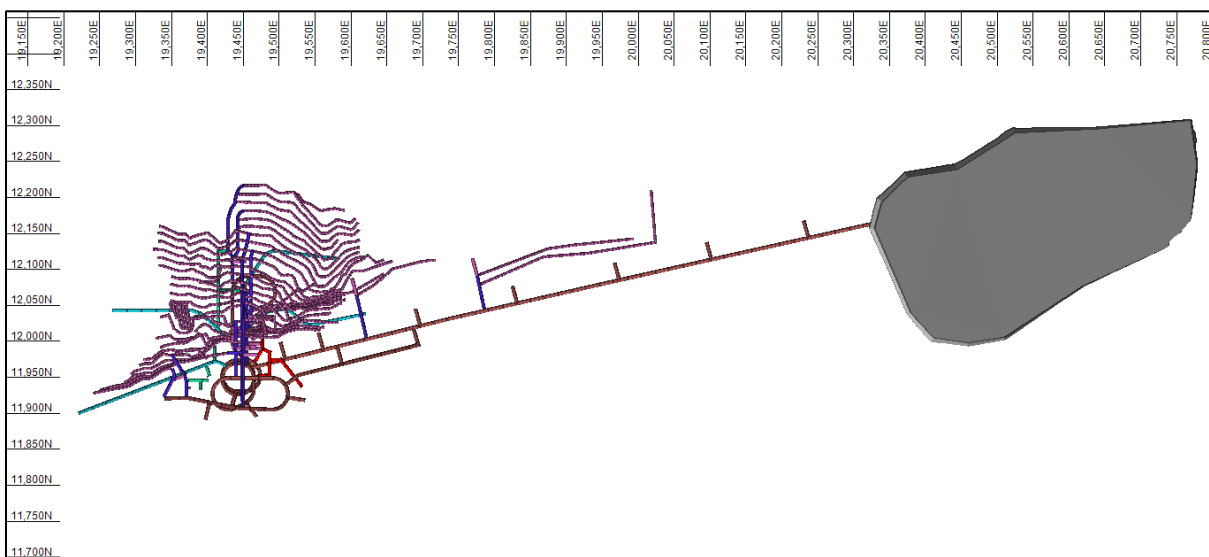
Long Section Looking South - Trident Underground Development Layout
